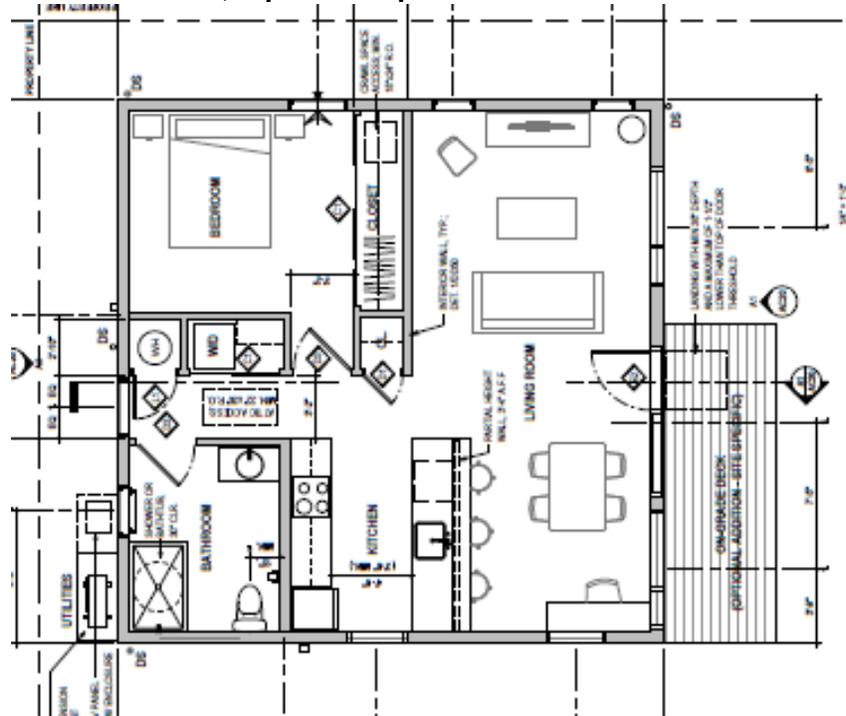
1-bedroom ADU Floor Plan (HEART GLADUR Plans Sheet AC11)
